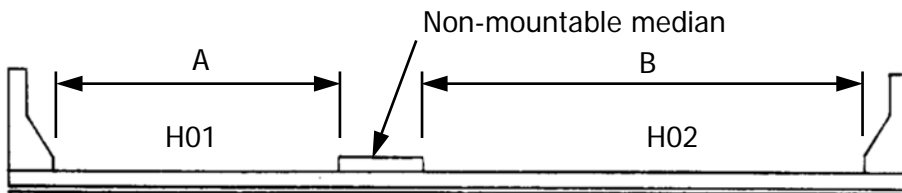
Cross-section view of two highway features carried on the bridge with a non-mountable median.
